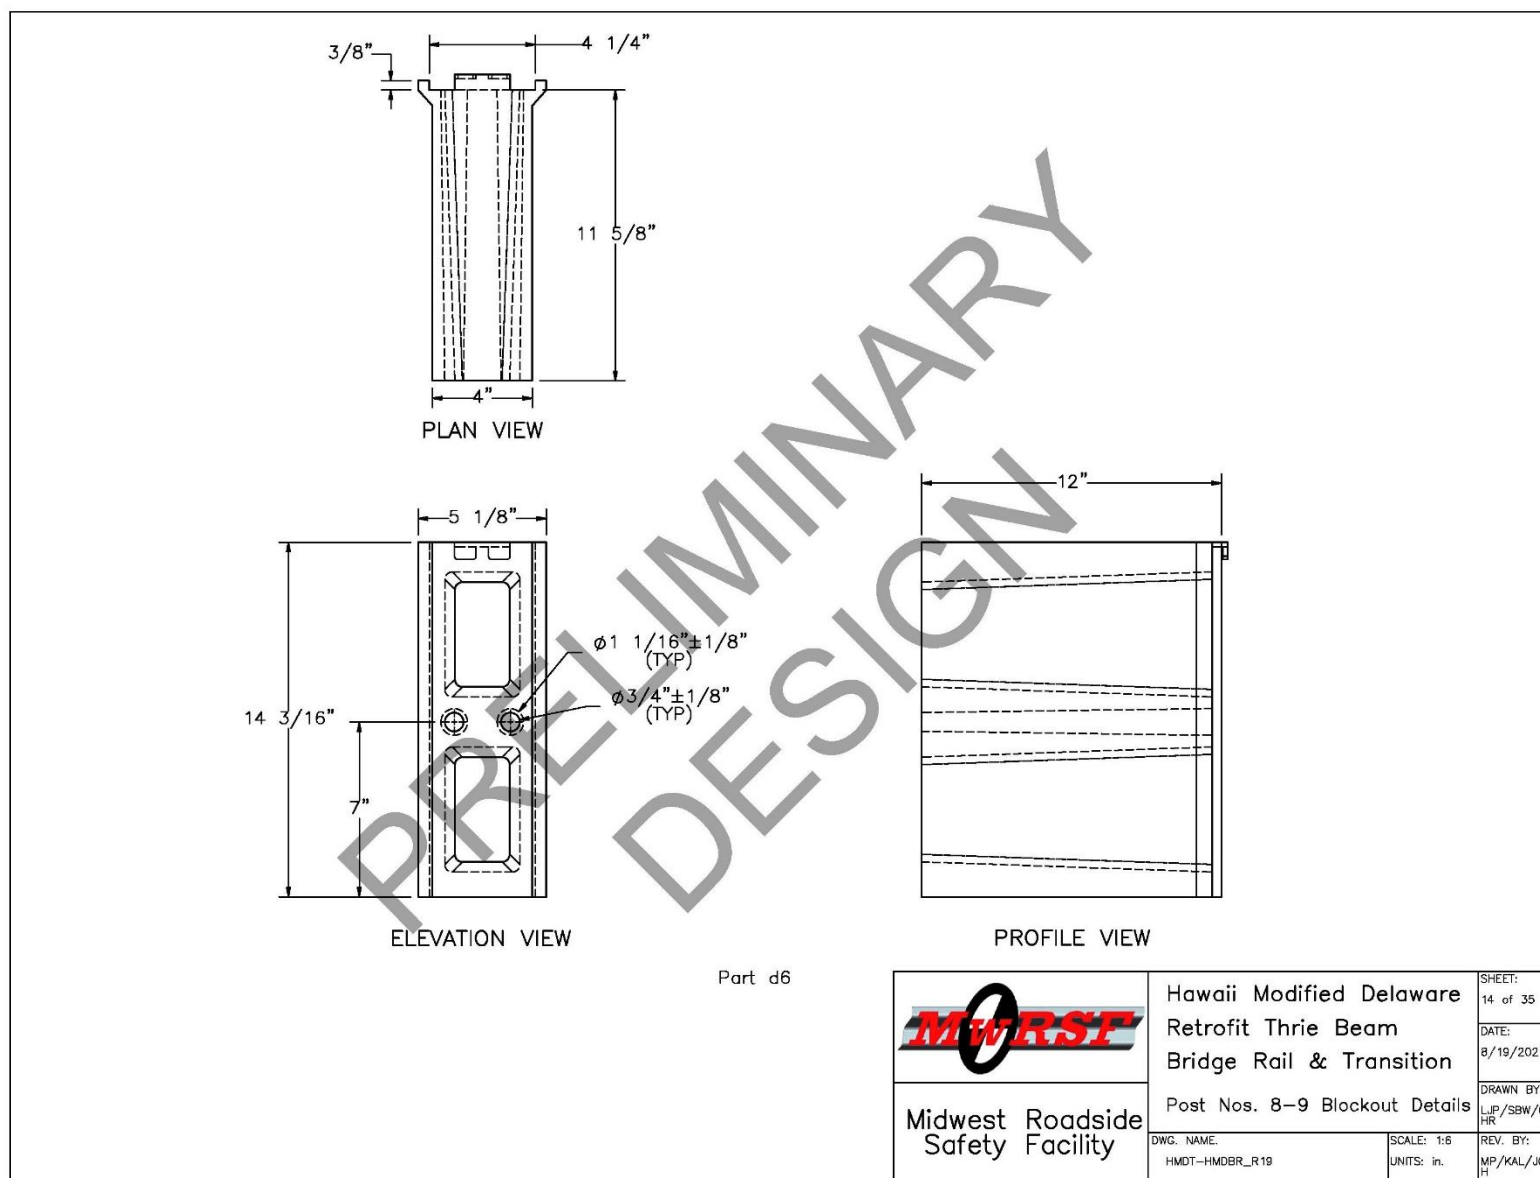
Post Nos. 8 and 9 Blockout Details, Test No. HMDT-1
